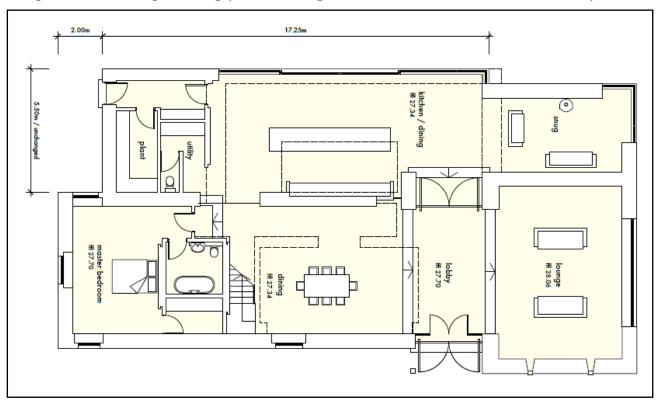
Proposed ground floor plan with replaced rear shippon to the top centre/left
